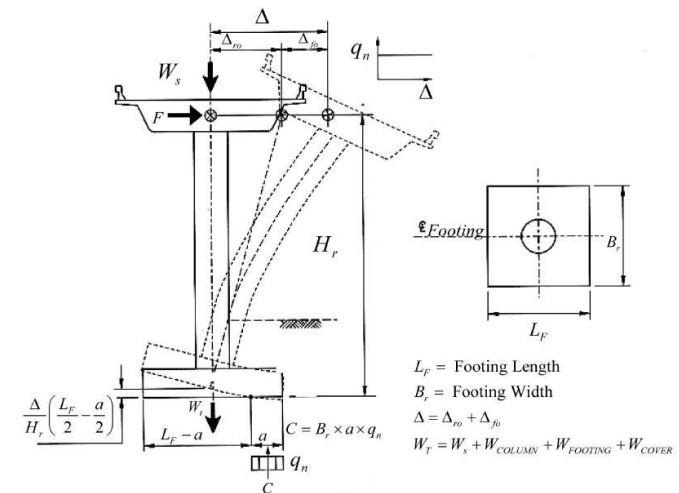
Rocking Equilibrium of a Single-Column Bent
